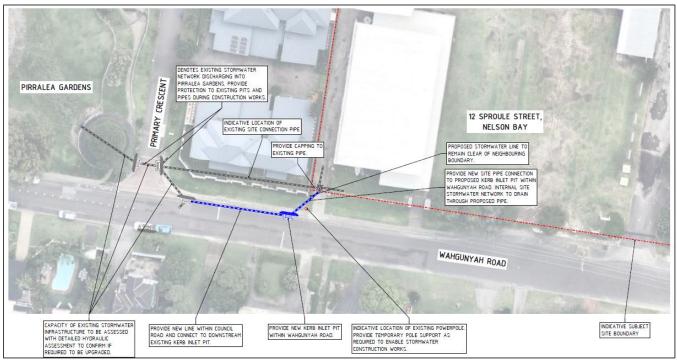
Proposed stormwater works within Wahgunya Road Reserve
